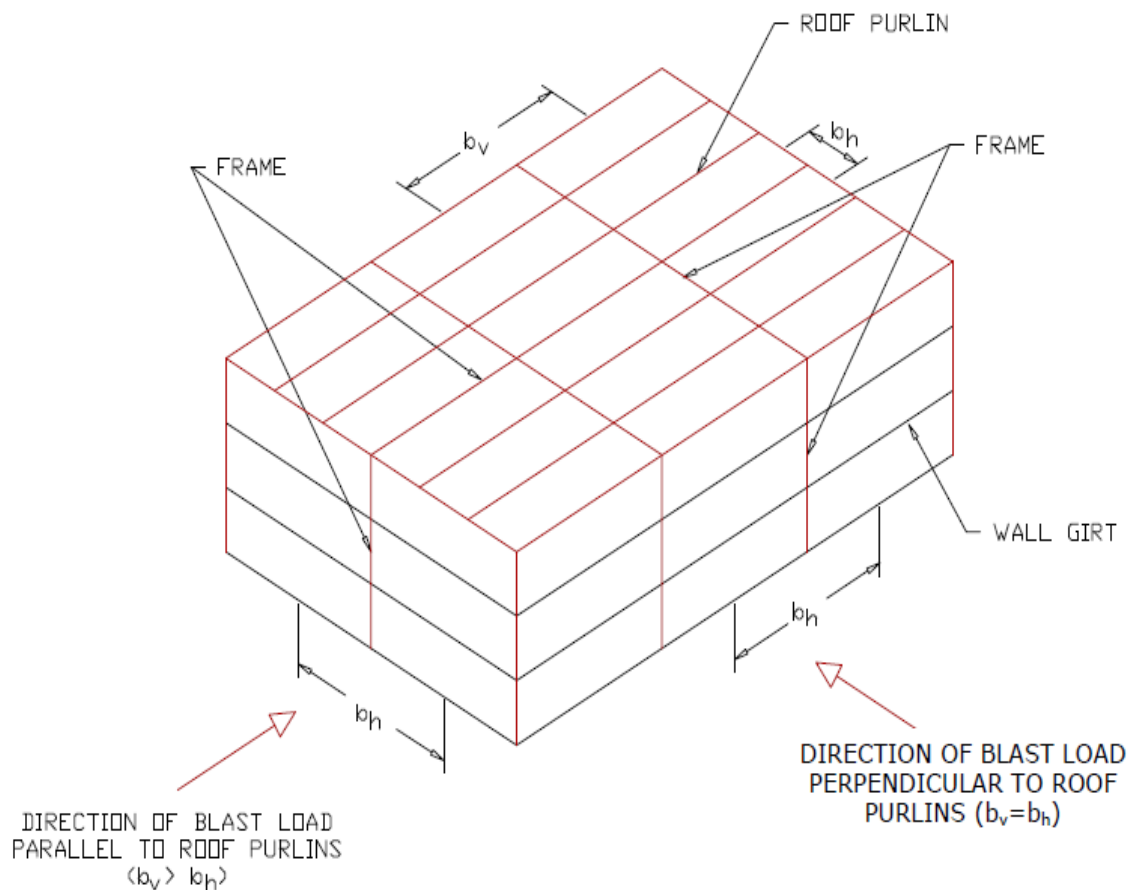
Orientation of Roof Purlins with respect to Blast load direction for Frame Blast Loading (UFC 2005).
